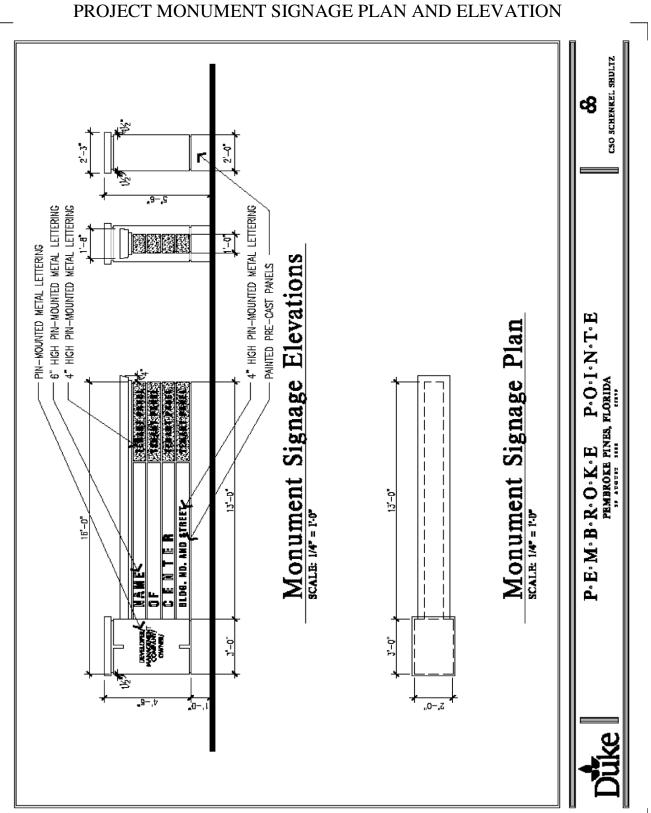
PROJECT MONUMENT SIGNAGE PLAN AND ELEVATION
